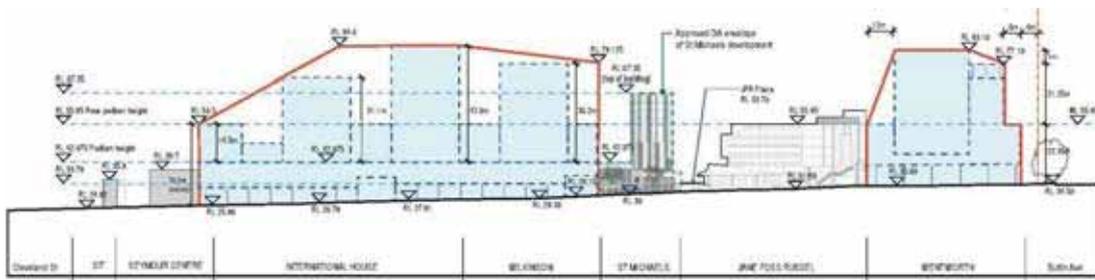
City Road Precinct: City Road elevation, proposed development.
